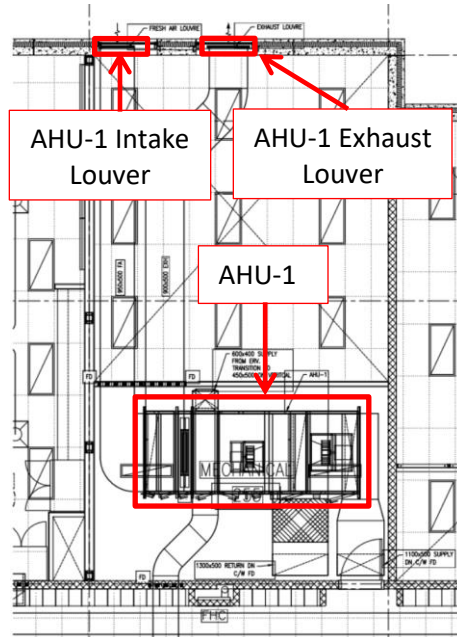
Second floor West mechanical room plan showing location of considered equipment.
